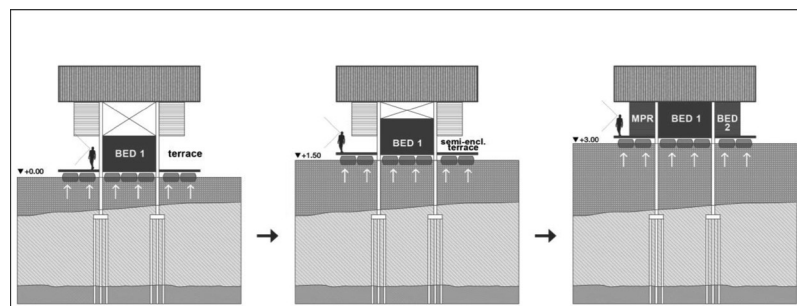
The conceptual idea of longitudinal section shown integrating the floating floor & walls to the fixed column supporting roof above, and how its adaptation from an outdoor terrace to be an extra bedroom when 3-meters sea level rising in the next 30 years. (Source: designed by the authors)
